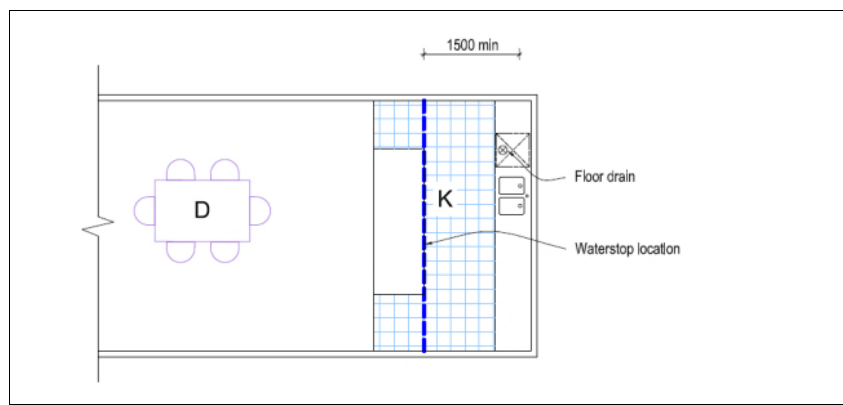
Extent of waterproof membrane system for island bench with sink at the back bench
